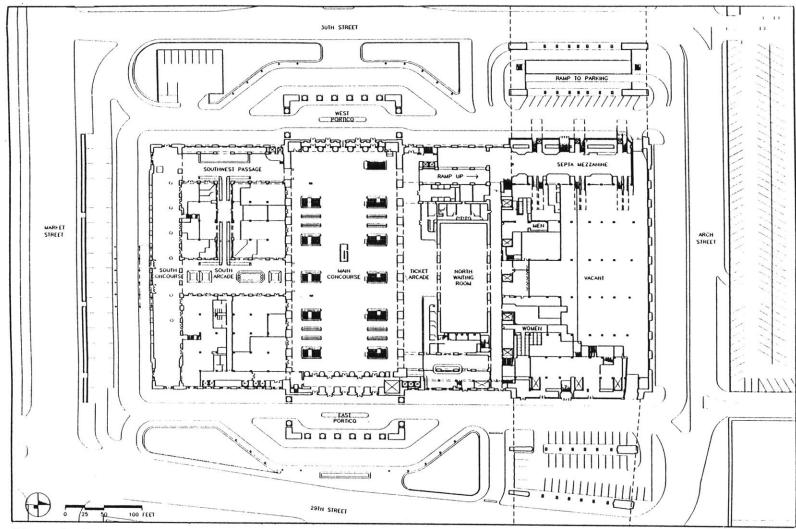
First Floor Plan of the Redeveloped 30th Street Station Source: Dan Peter Kopple & Associates, 1996
